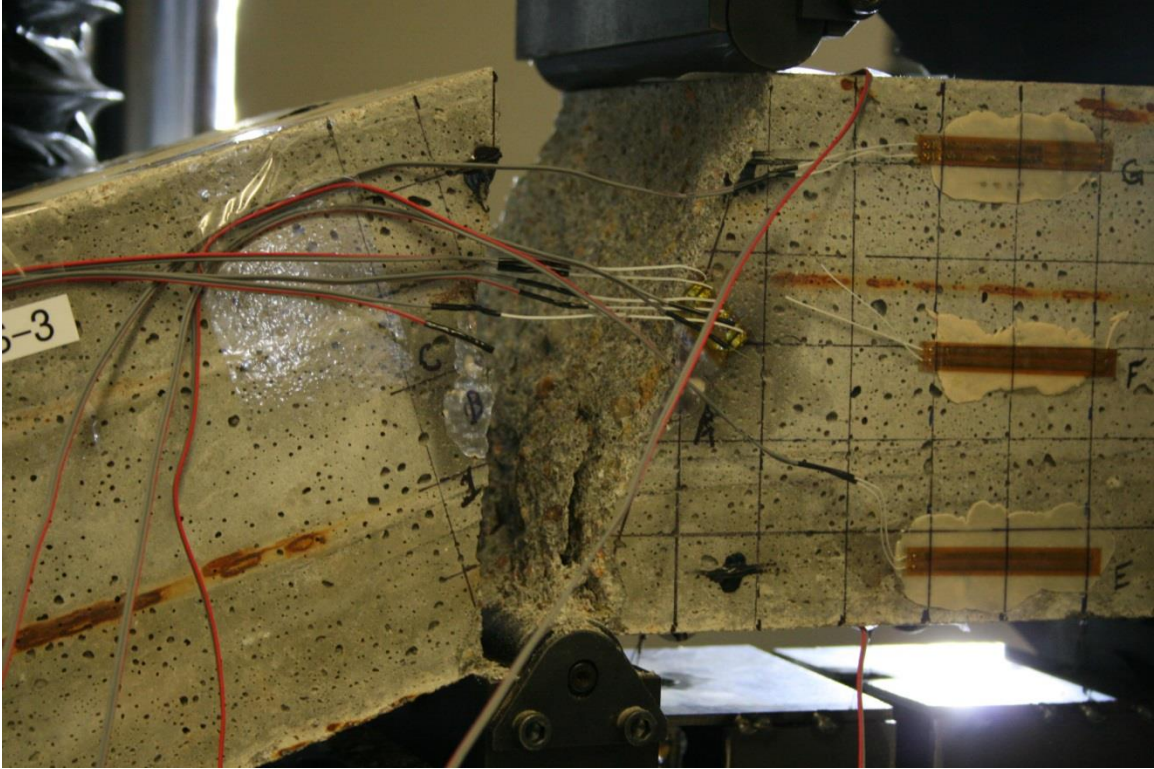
Additional Post-Test Damage, Test No. CFS-3 [10-in. (254-mm) Span]
